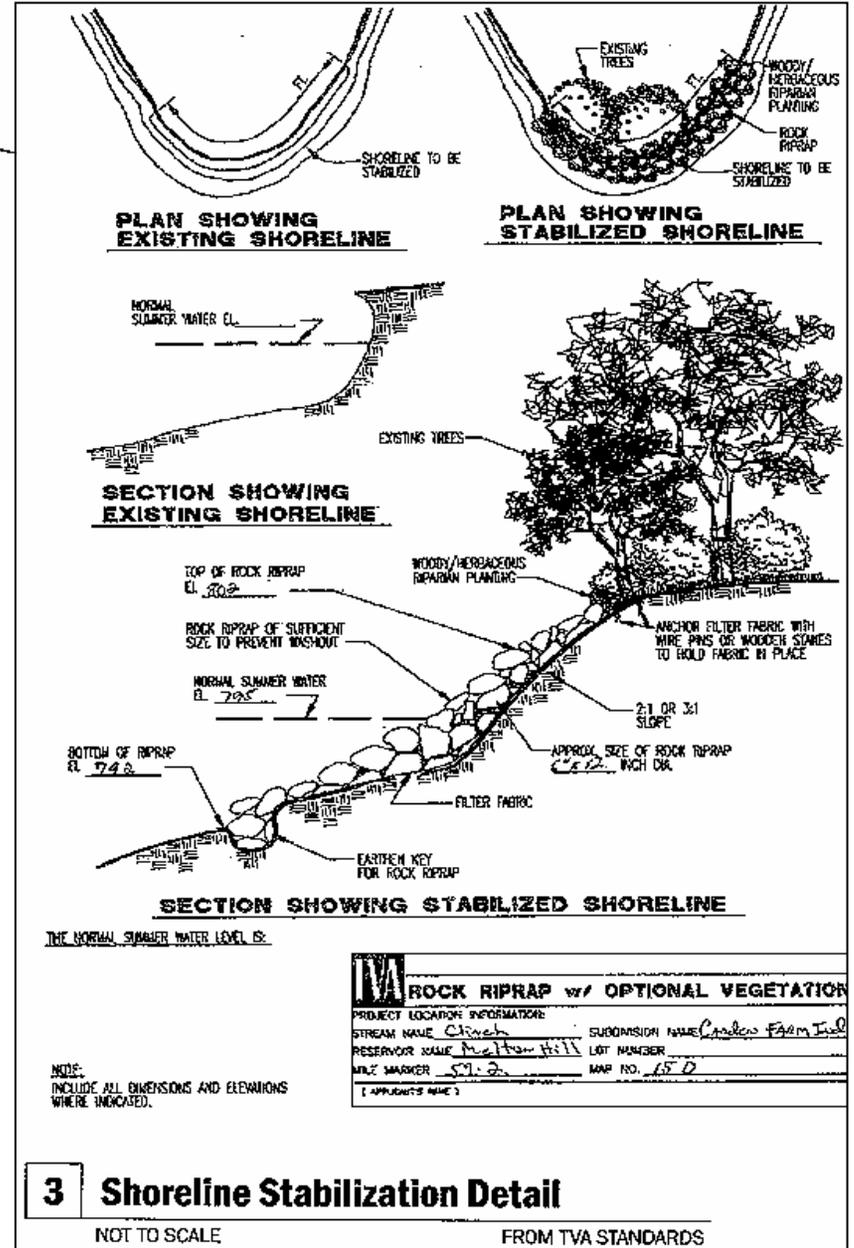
City of Clinton, Carden Farm Sports Complex and Riverwalk – Bank Stabilization and Boat Dock Plans
